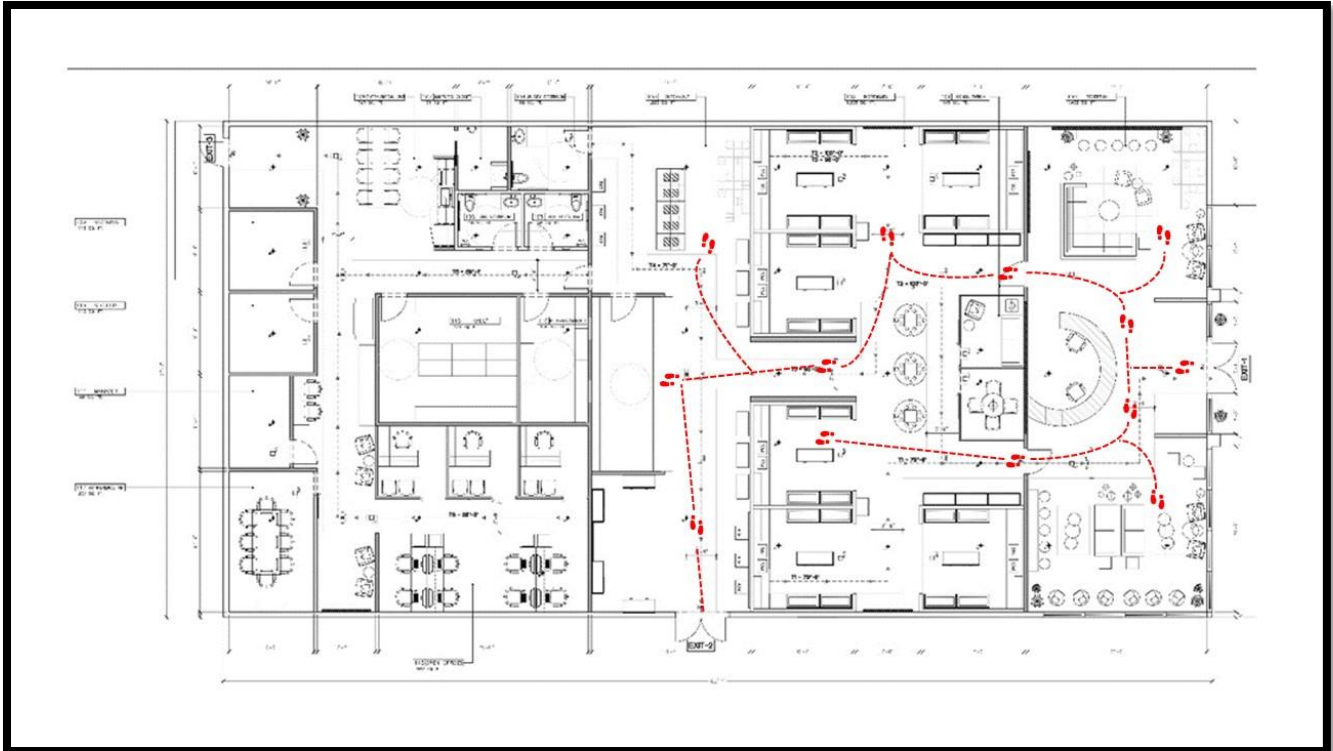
(proposed CROP layout design at 655 Cochituate Road, Framingham)
